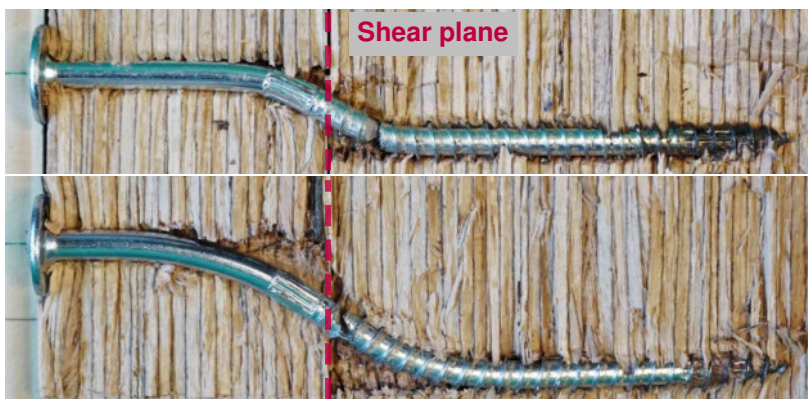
Fastener failure of non-predrilled (type 1) single screws in connection tests: Failure in plastic hinge of the middle timber at the top. Failure in the shear plane at the bottom.
